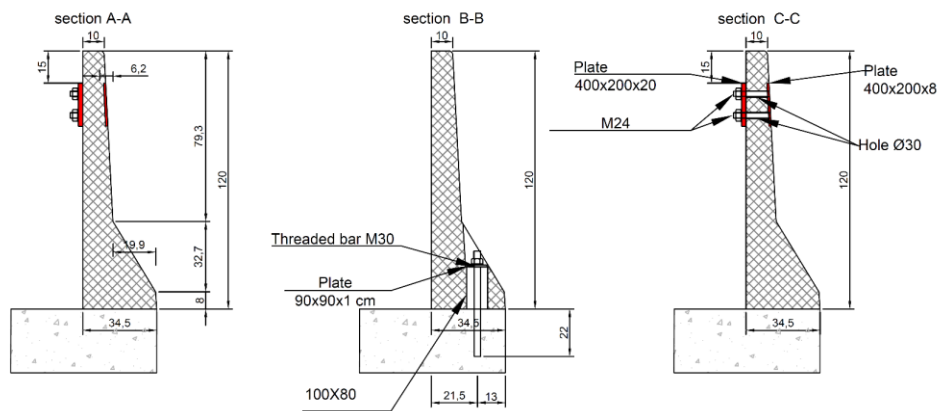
Sections of the “NDBA Tunnel” barrier (dimensions in cm)
